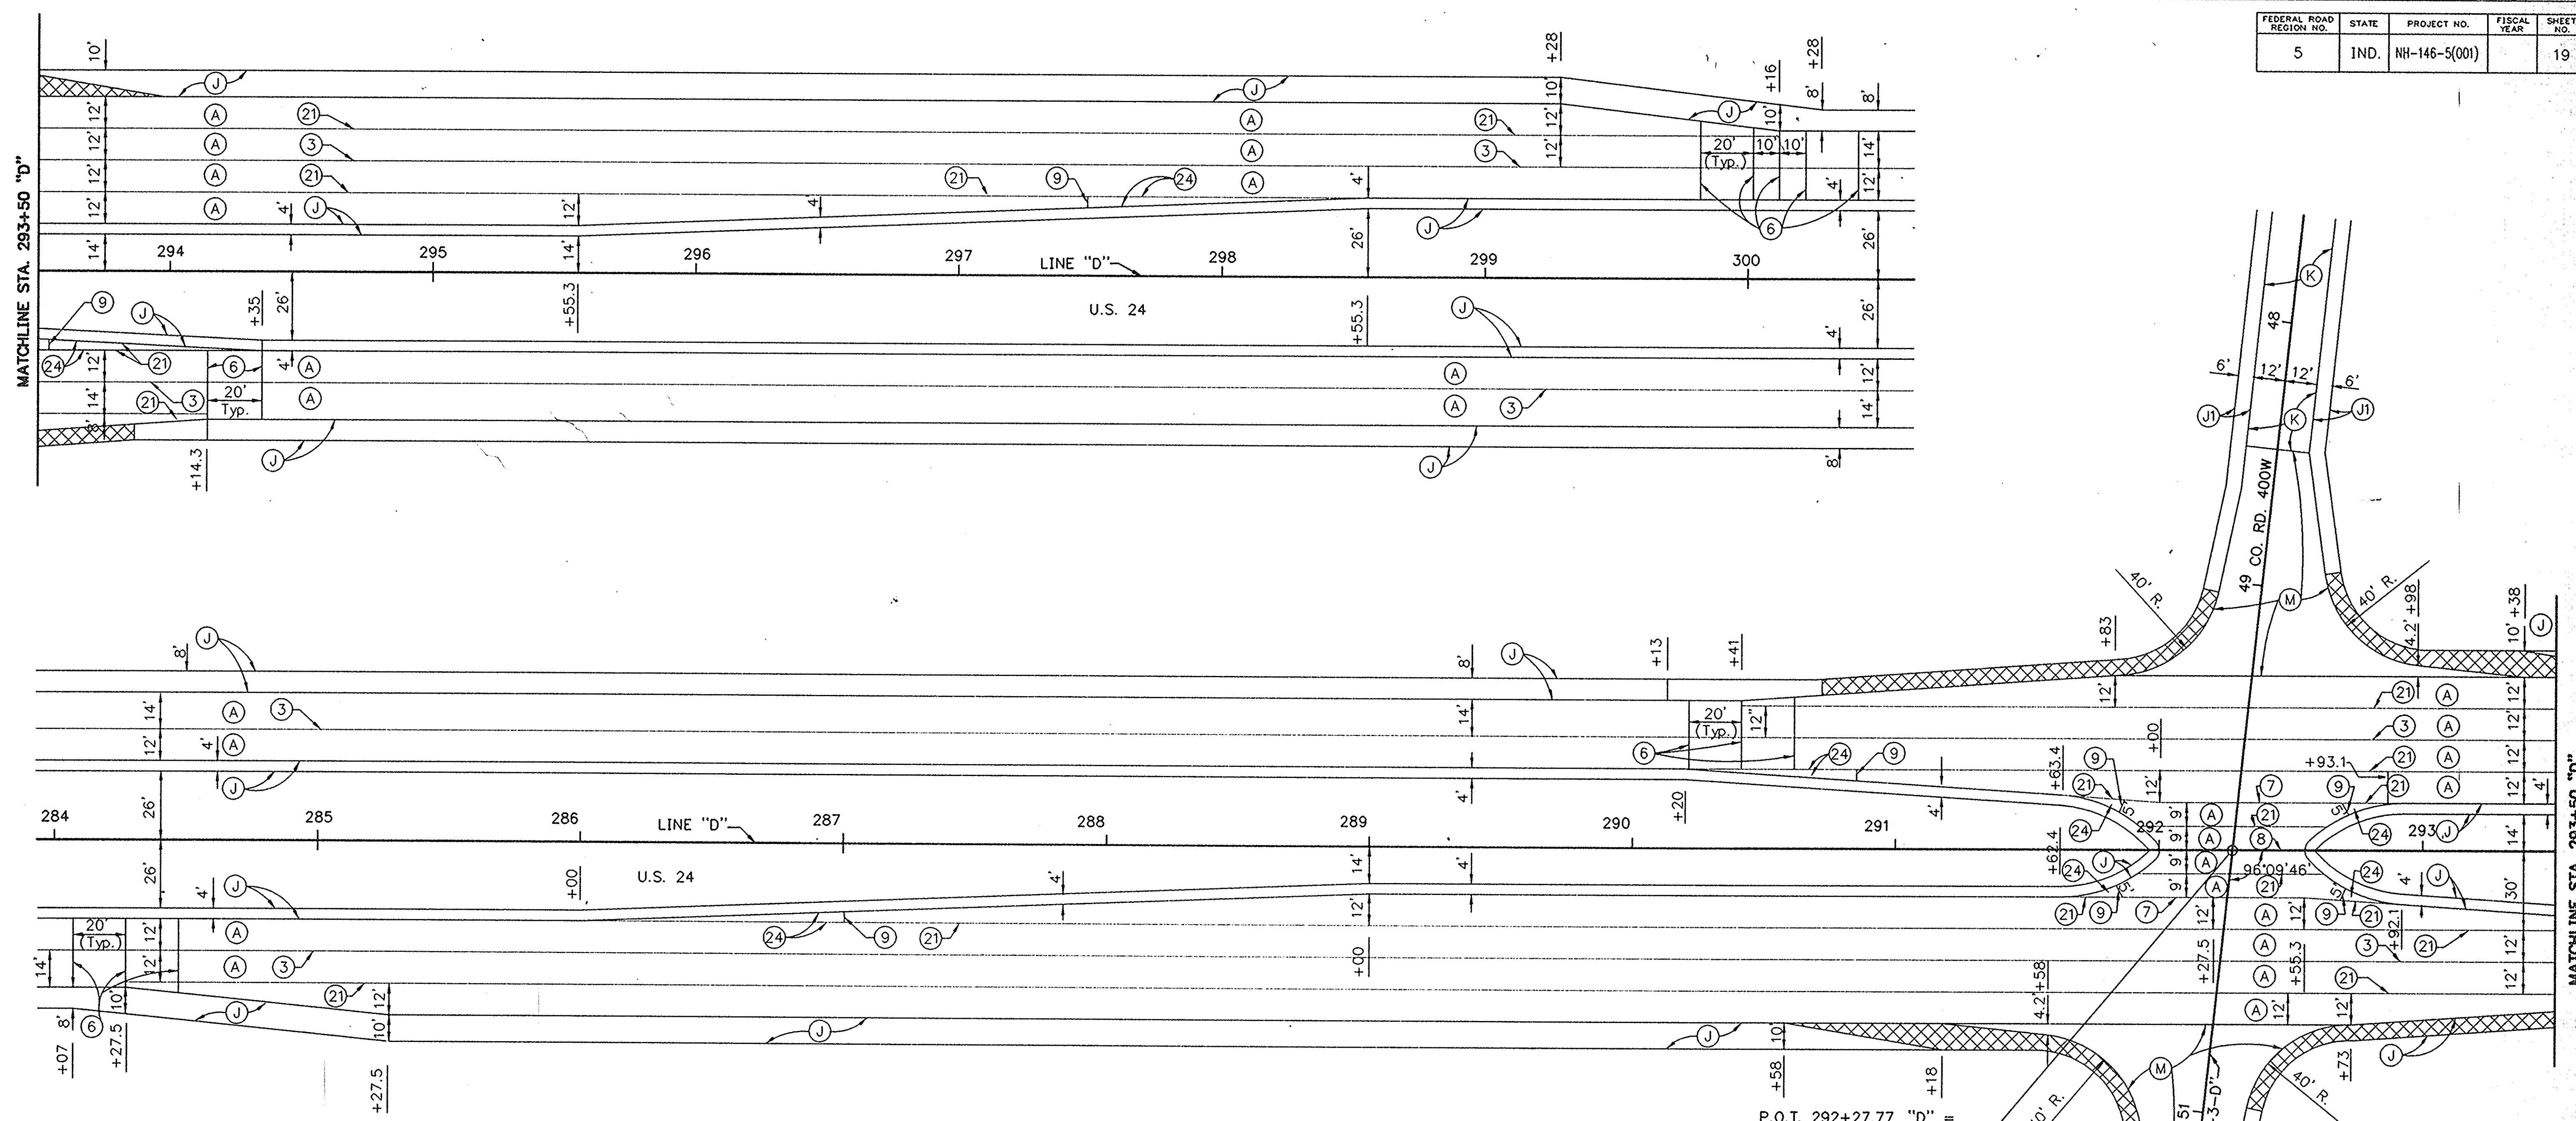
PLAN - PROFILE B & R STANDARD 1975
